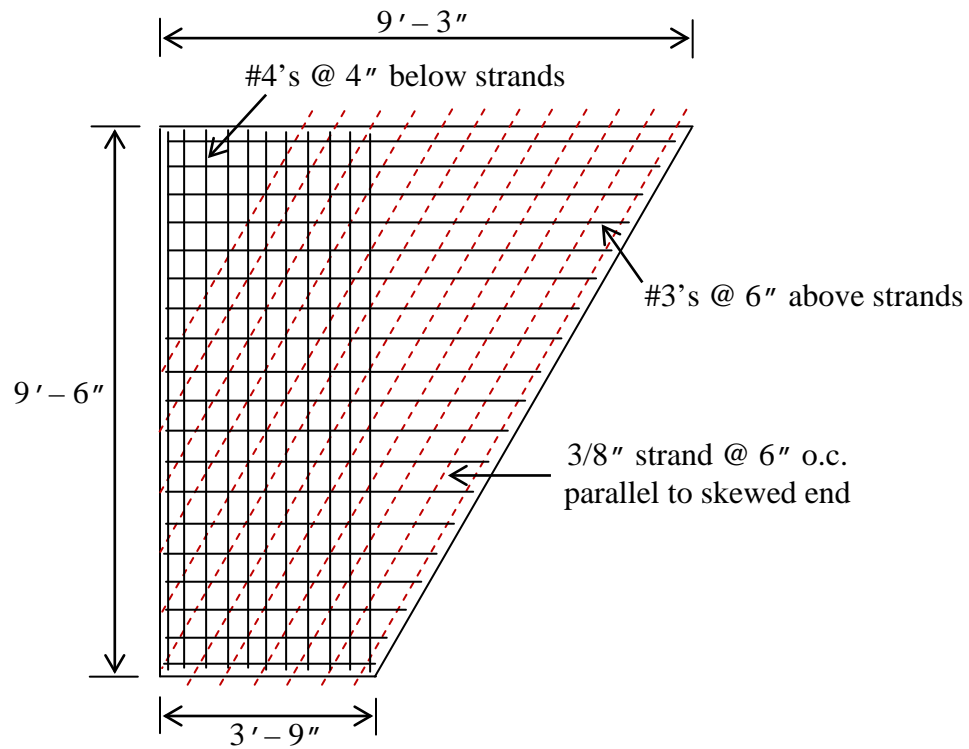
Skewed Panel Reinforcement for Specimen P30P3
